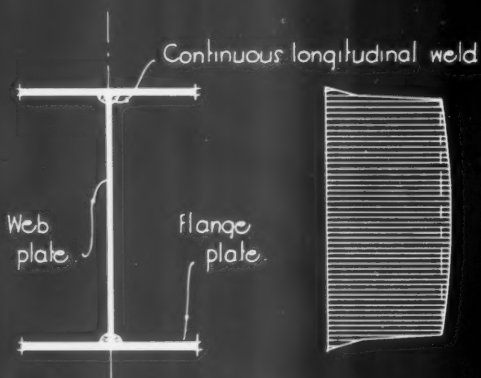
TYPICAL SECTION & SHEAR STRESS DIAGRAM FOR A PLATE GIRDER .
